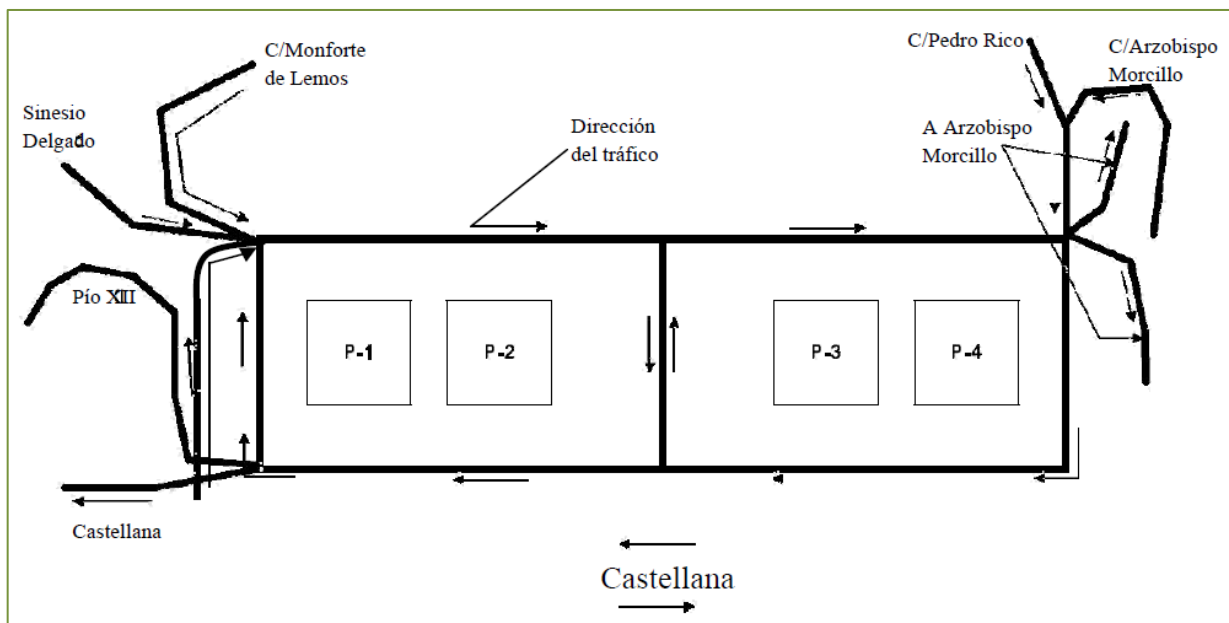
Cuatro Torres Tunnel entrances and exits ramps layout.
